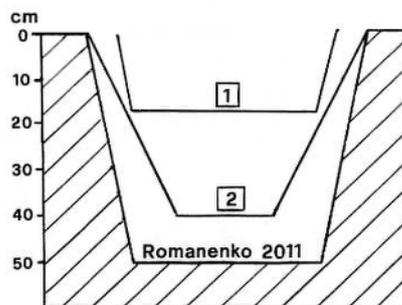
Cross-sections of the trenches tested on this site (1 = test trench, 2 = larger trenches currently being installed) and by Romanenko (2011).
